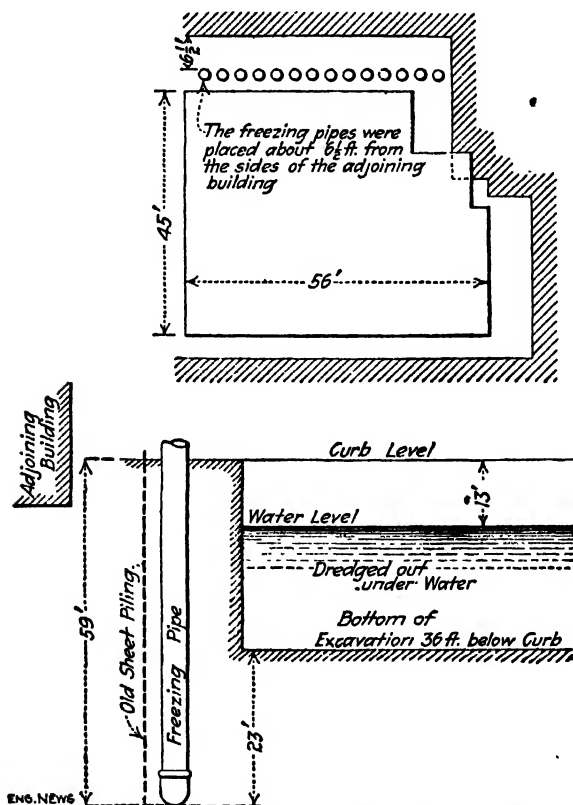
Building Foundation Constructed under the Freezing Process.
